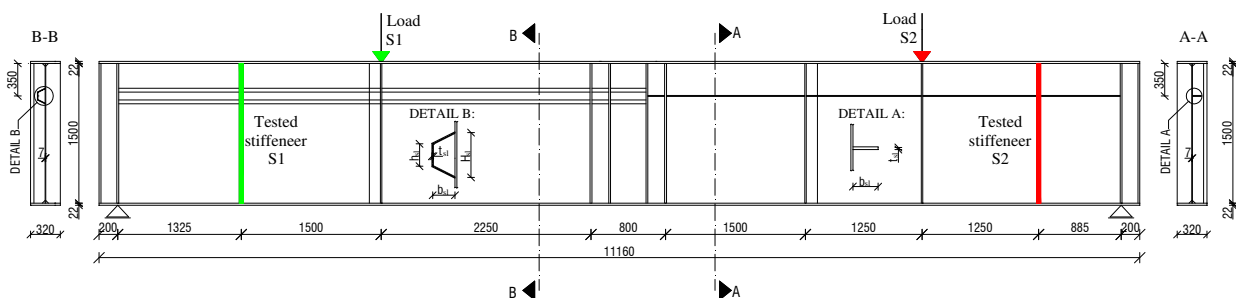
Layout of the tested girder and loading positions for tests S1 and S2
